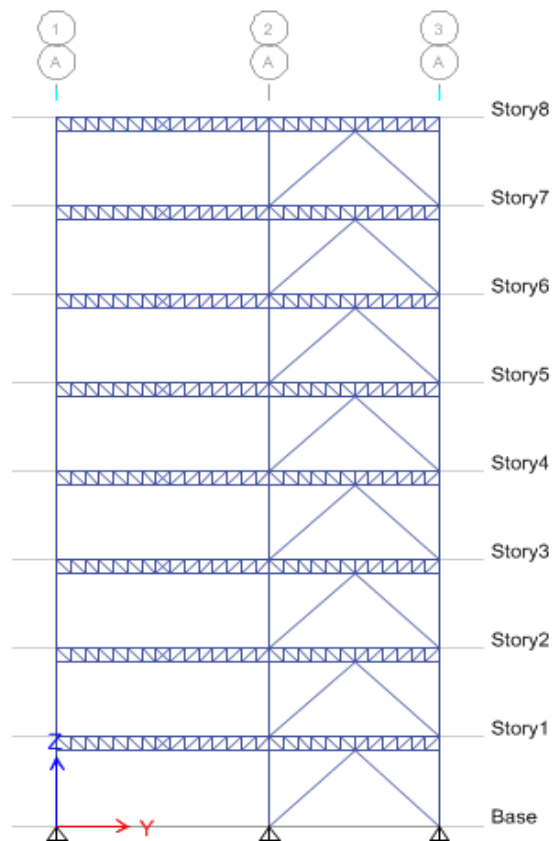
Typical truss-beam and bracing elevation of the dormitory building (IR4F-T) in y-direction.
